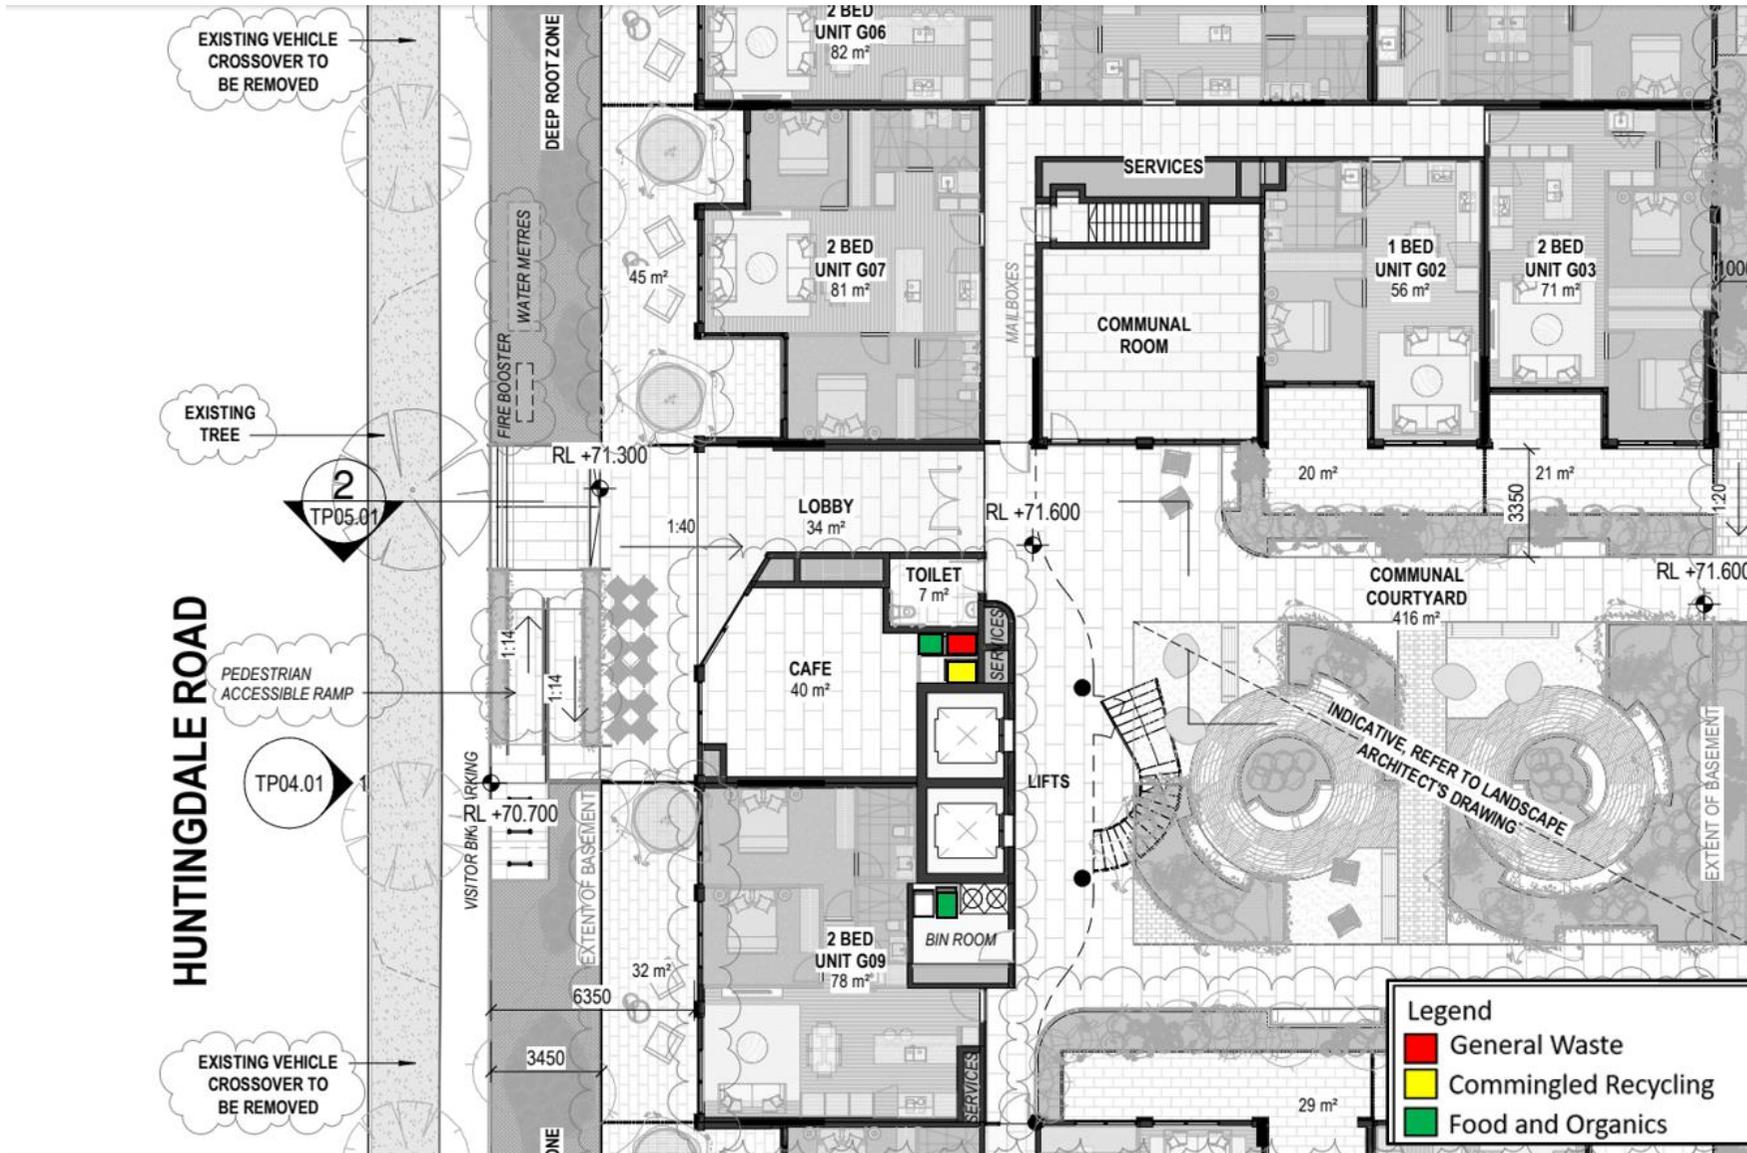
DEVELOPMENT PLAN – CAFÉ AND APARTMENT GROUND FLOOR BIN STORAGE AREA – CURRENT
